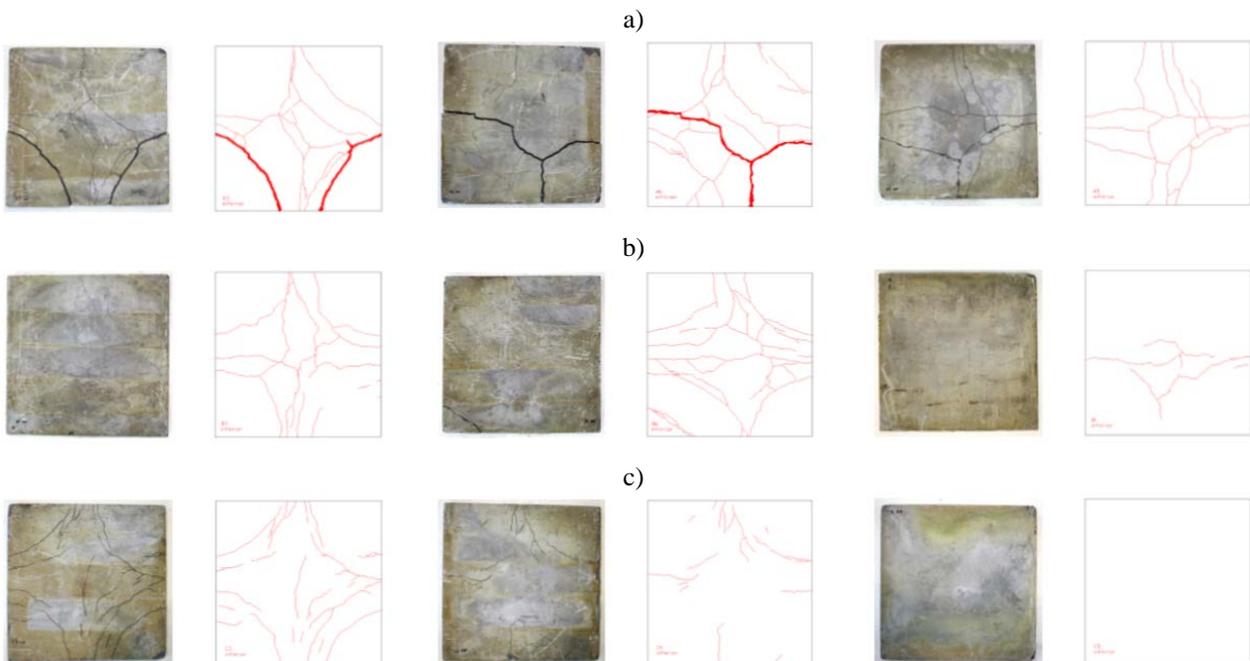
Crack trajectories registered after the tests: a) for the A concrete slabs; b) for the B concrete slabs; c) for the C concrete slabs.
